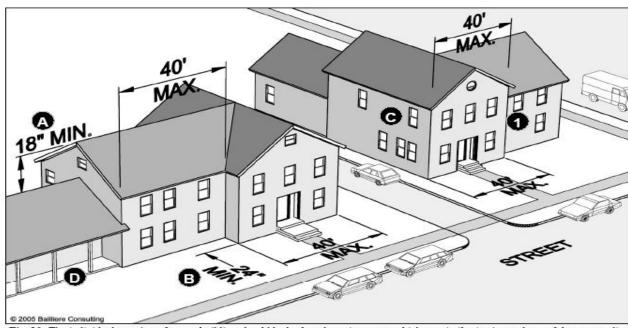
The individual massing of a new building should be broken down into parts which are similar in size to those of the surrounding buildings. Changes in the plane of the façade or roofline help to break the mass into smaller parts, giving the architecture a more residential scale in keeping with the Village character.
